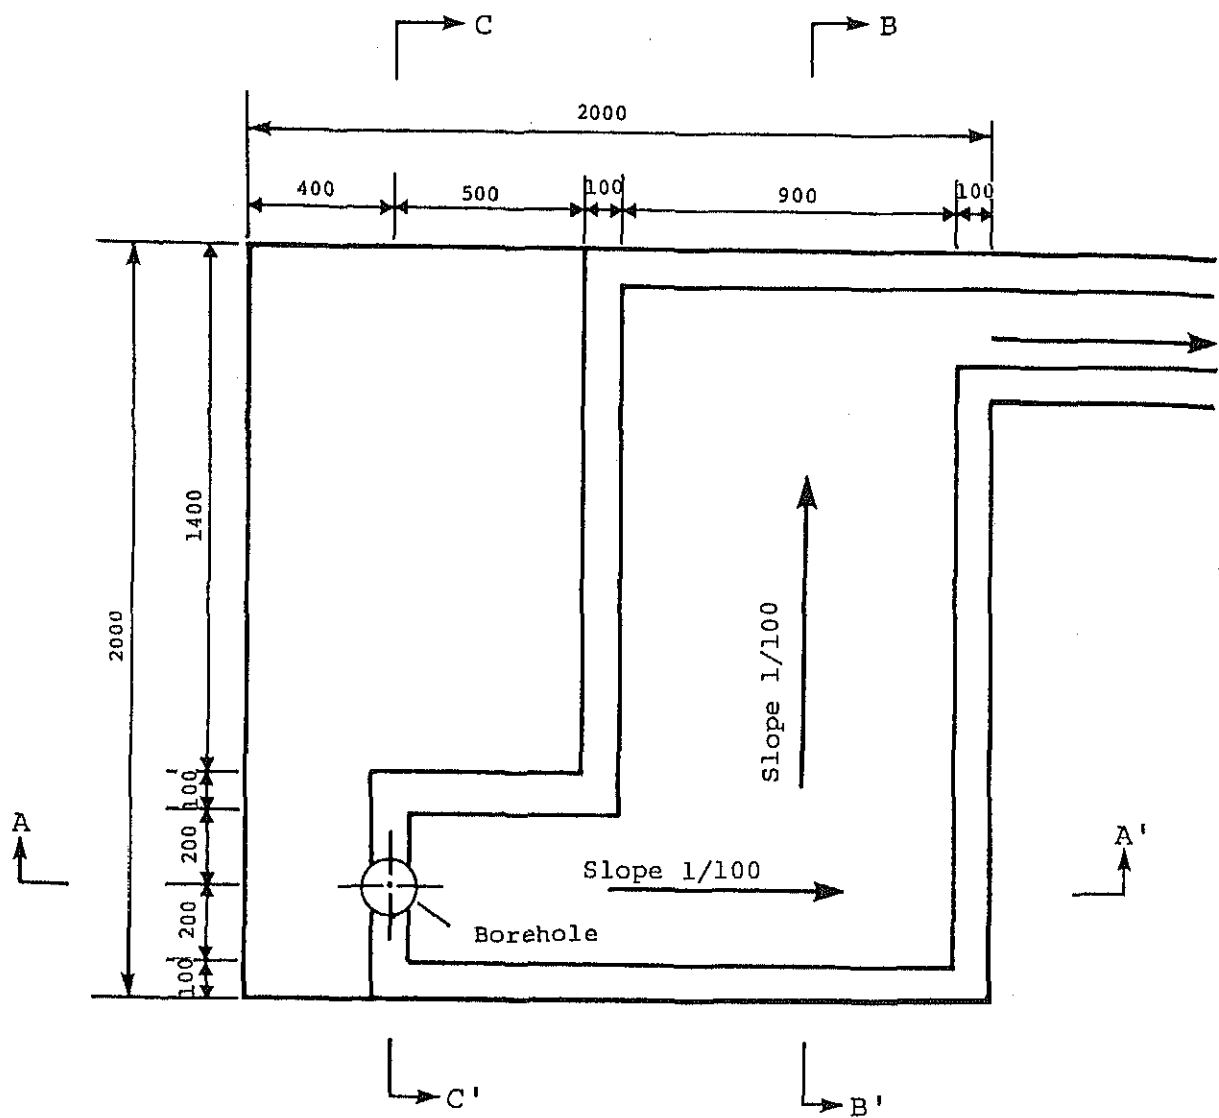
GENERAL PLAN OF CONCRETE SLAB AND APPURTENANCE
